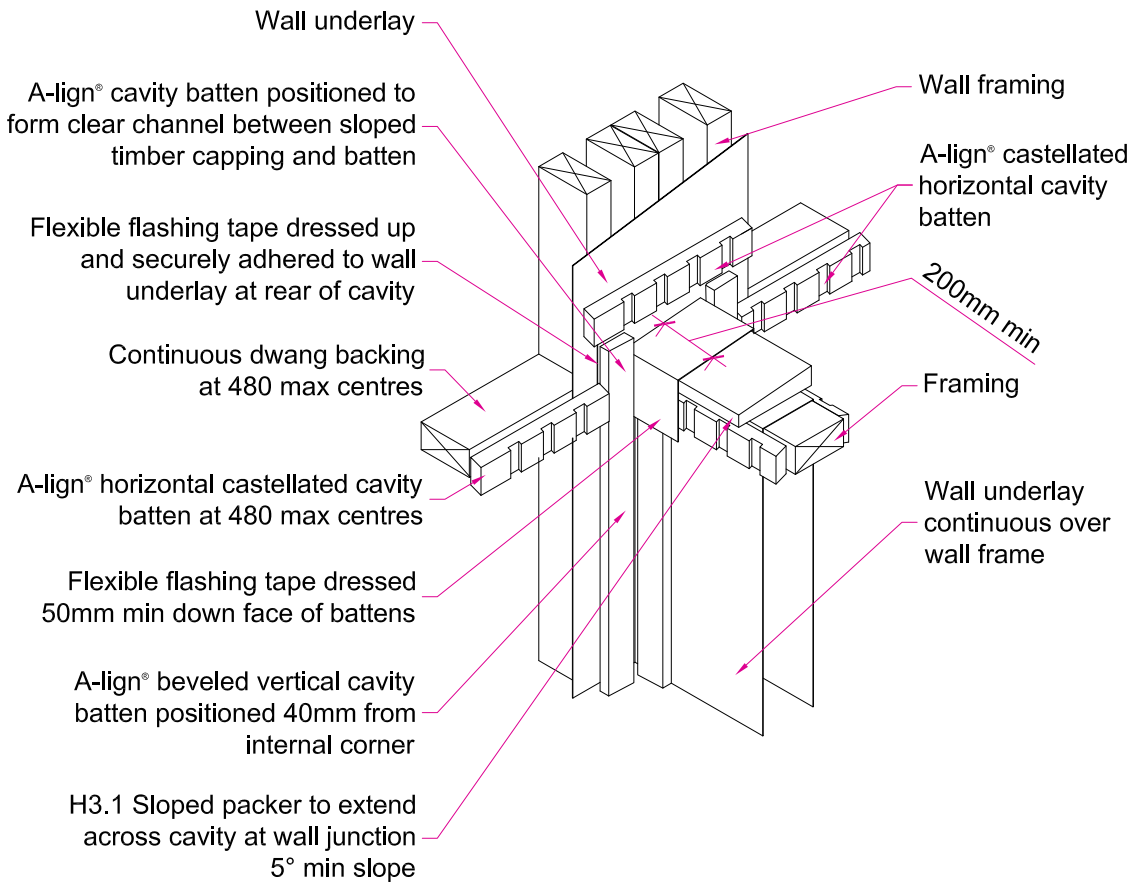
Cavity fixed – parapet – balustrade – wall junction internal butt
